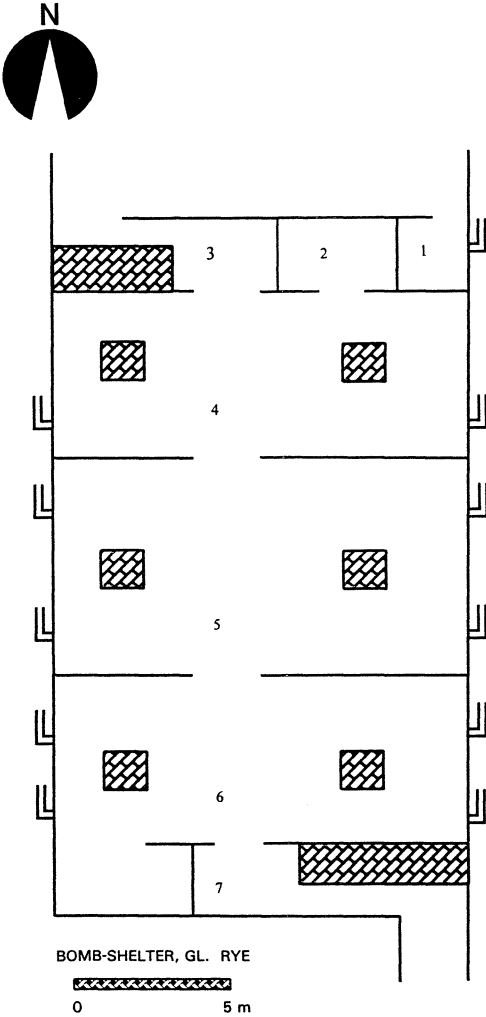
Floor plan of the bomb-shelter at Gl. Rye. In the text rooms 4, 5 and 6 are referred to as "inner bomb-shelter"; the eleven air shafts are shown. Redrawn after plan by Birger Jensen.
